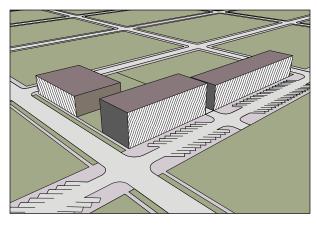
Lot frontage. Primary lot frontage shown hatched.
